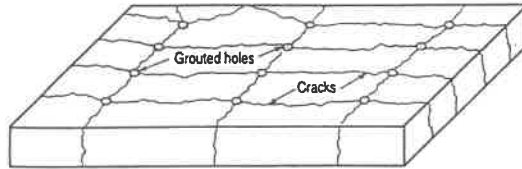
Application of grouting in rock excavation (After Kosmatka, 1990)
